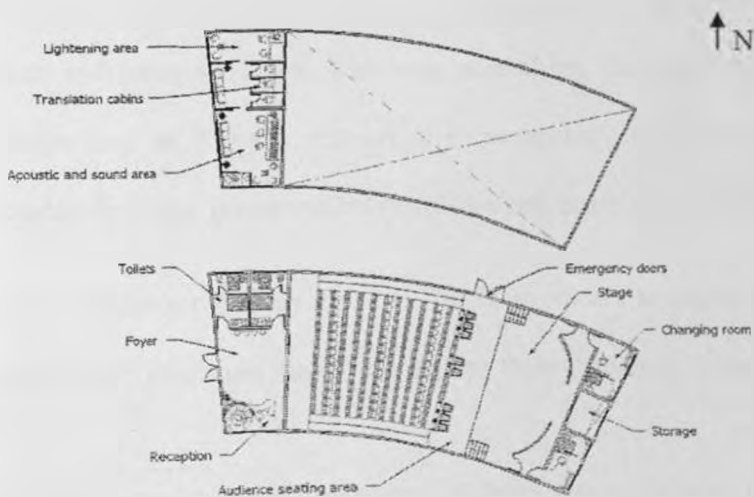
14 – Amphitheatre building layout plans, ground and first floor. Source: Author, 2013.
